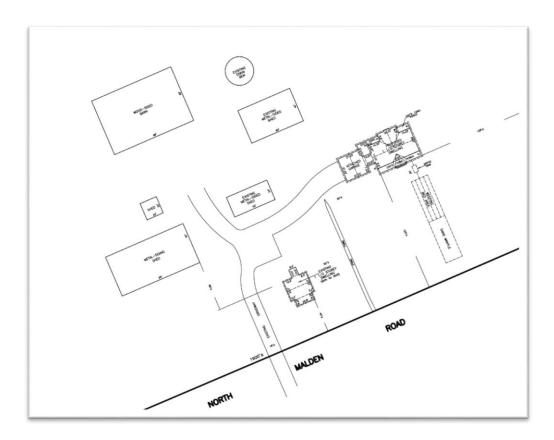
Site Plan depicting existing dwelling to be converted into housing for farm help
